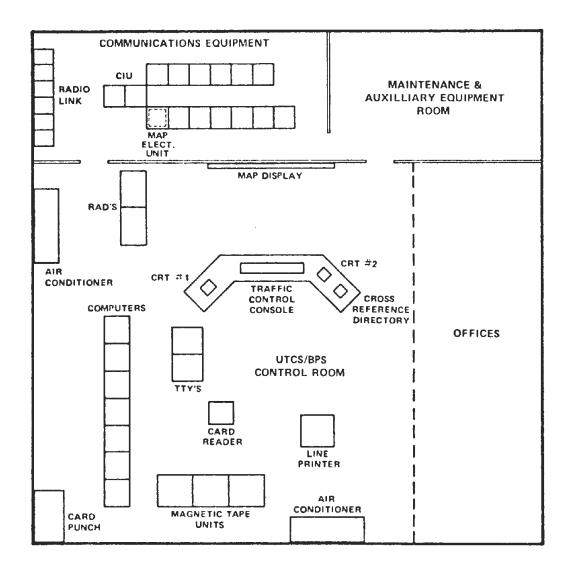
Floor Plan of UTCS/BPS Washington, D.C., Control Center
